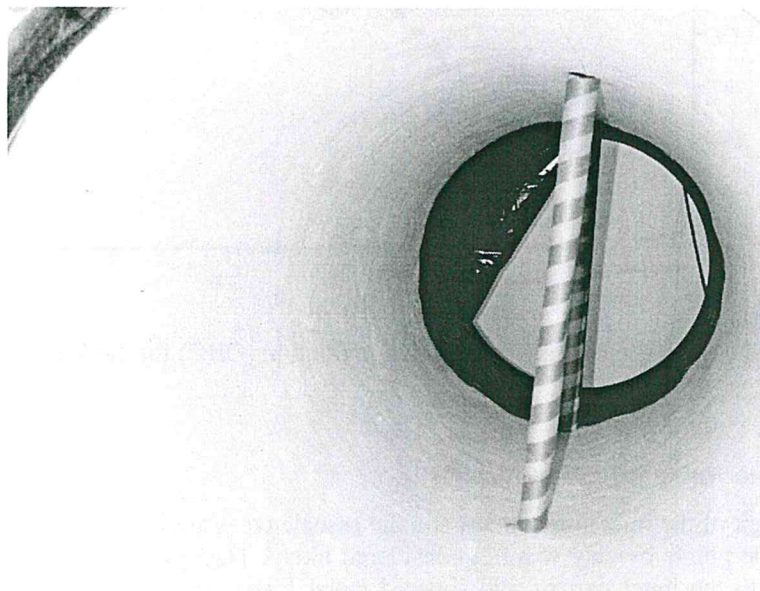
Installation of geotextile layers in the Mock-up Test structure prior to bentonite emplacement.
